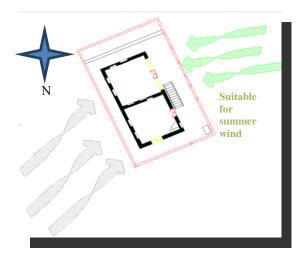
Proper orientation of buildings, suitable for summer wind and protection from undesirable winter winds
